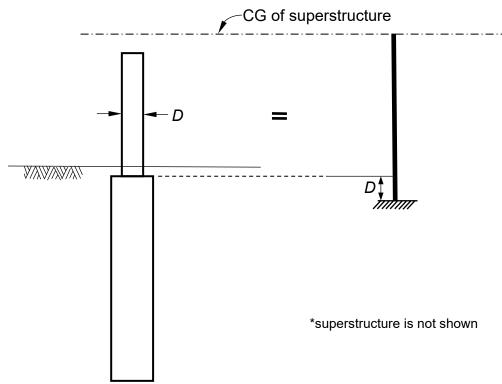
Structural Modeling of Type II Shafts
